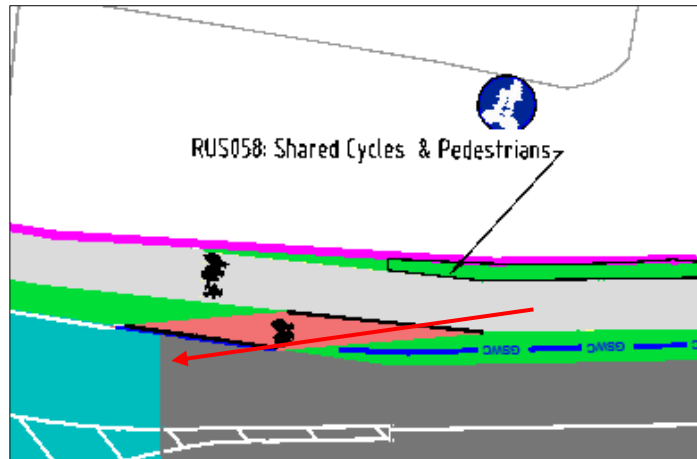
Proposed Crossing (Drawing 11199-08-1010-B)
